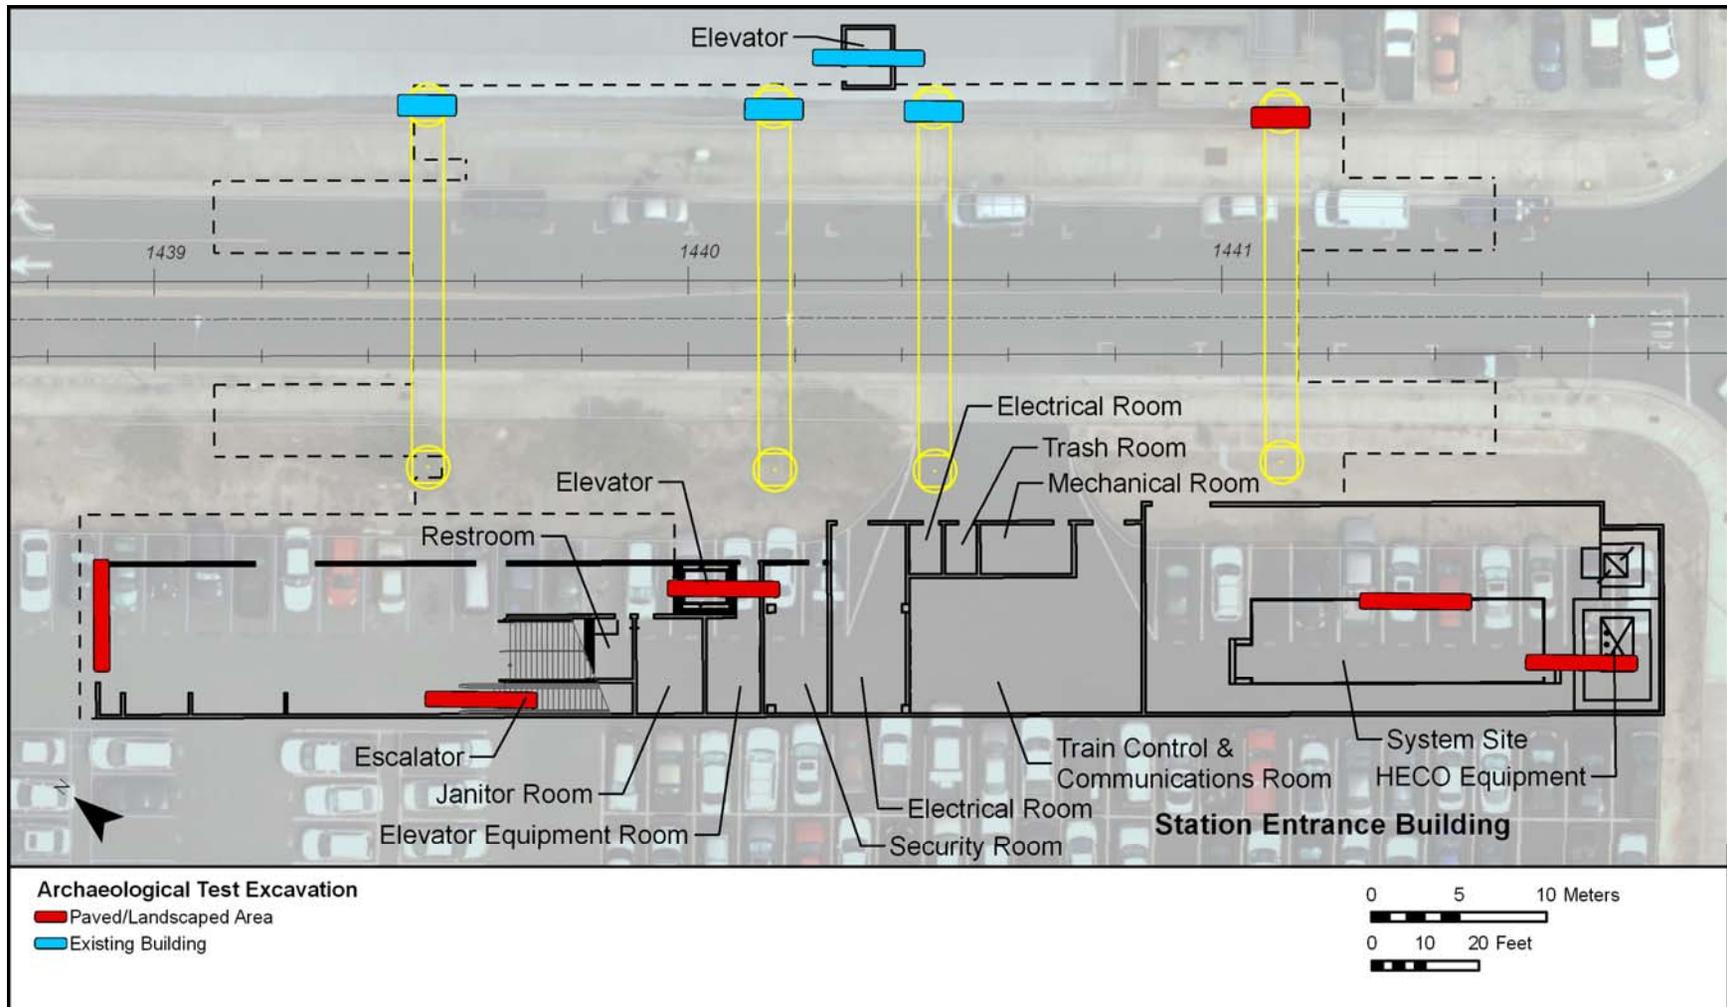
Civic Center Station, detail of (*makai*) Station Entrance Building (at *makai* side of Halekauwila Street northwest of Keawe Street), showing proposed locations for archaeological inventory survey testing (five 2' by 20' test trenches at (*makai*) Station Entrance Building to supplement 3½ previous test trenches within building footprint;
